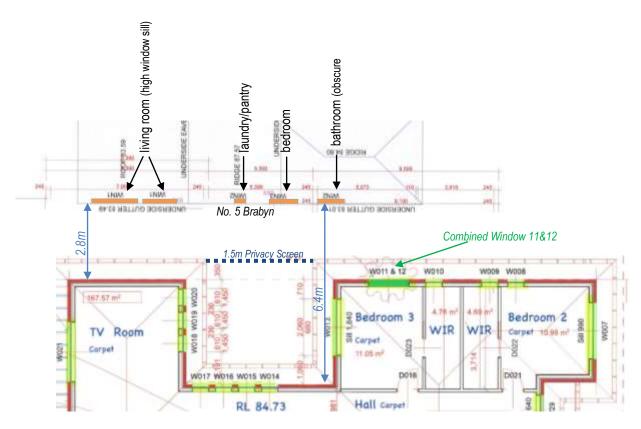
Proposed first floor aligned with ground floor of No. 5 Brabyn
